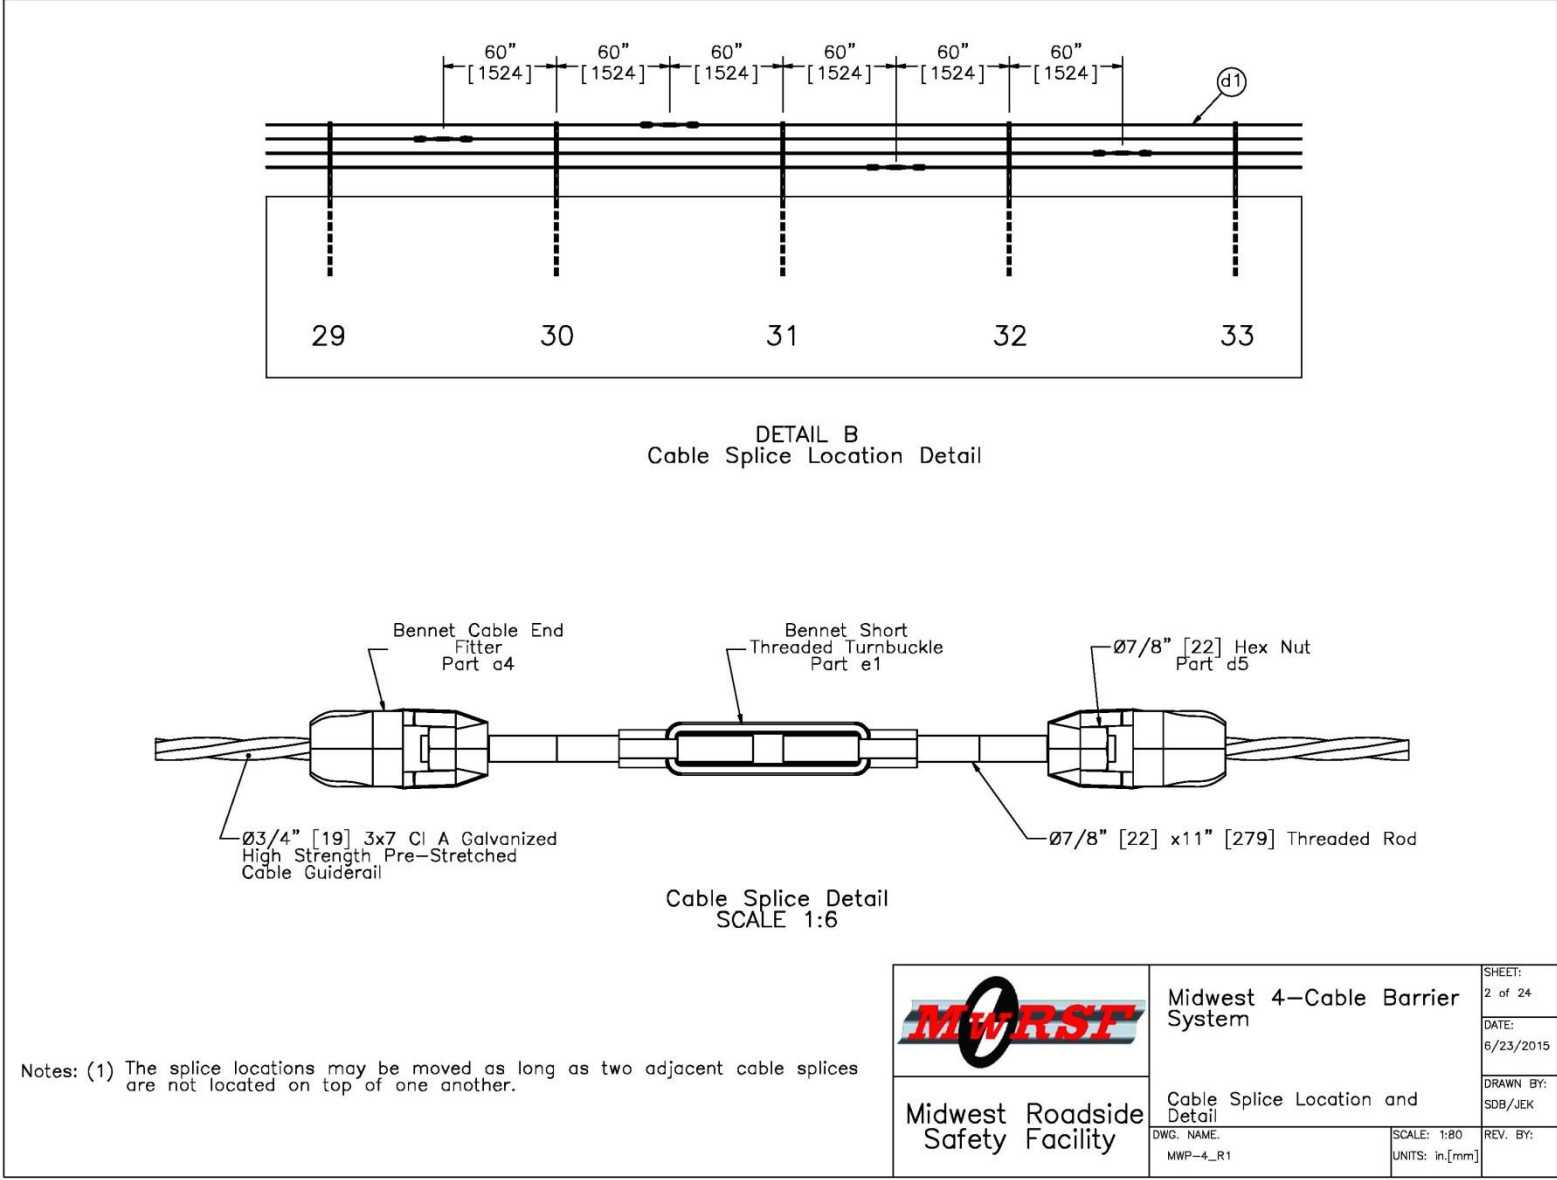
Cable Splice Location and Detail, Test No. MWP-4
